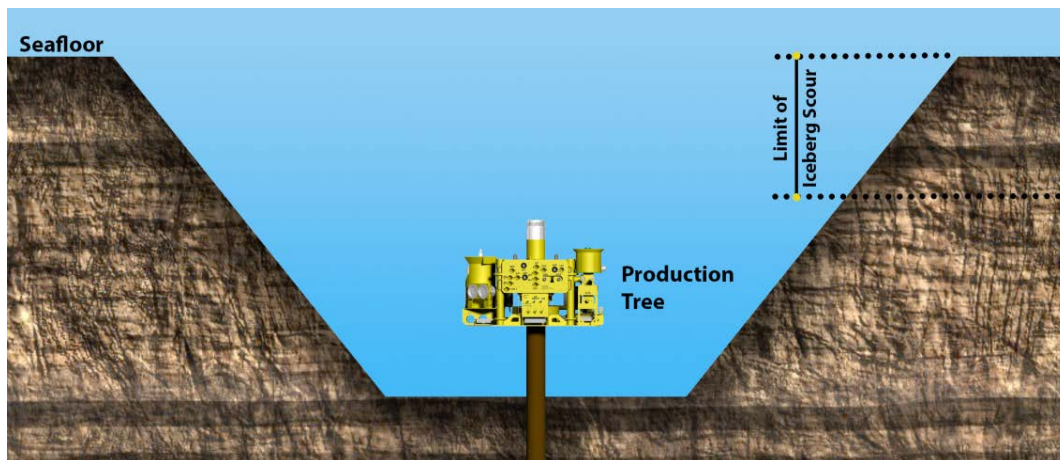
Uncased Excavated Drilling Center Arrangement
